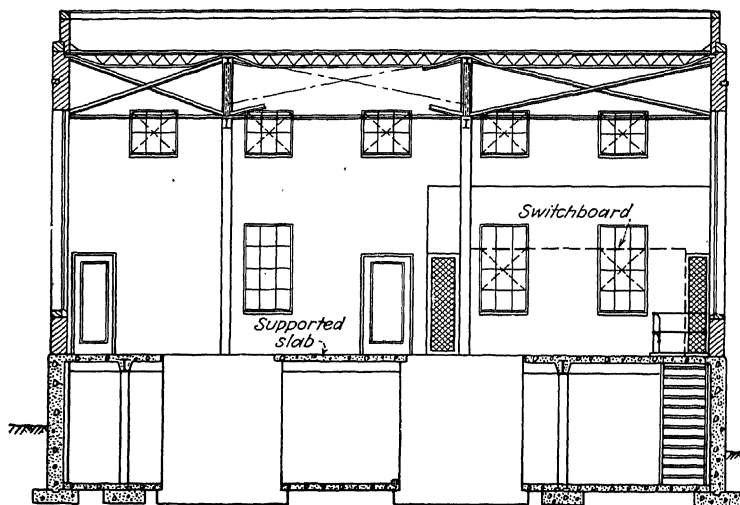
Plant designed with floor slab supported by the adjoining engine foundations.
